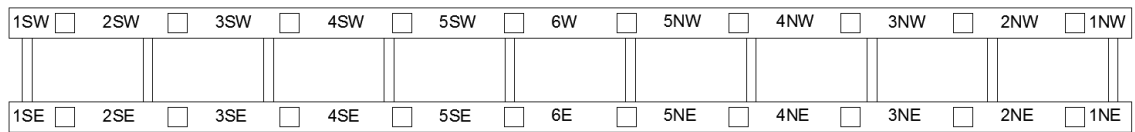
Plan view of the arches, struts, and column pedestals showing the bay labeling scheme
